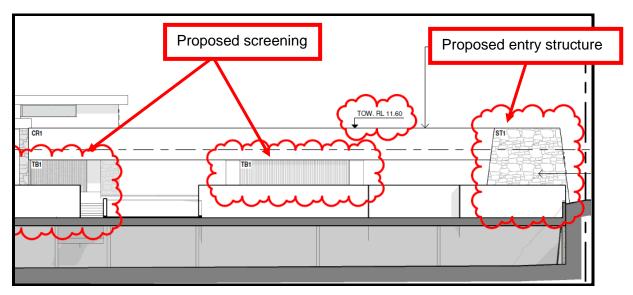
Proposed Car Park elevation to the foreshore (south) (Source: Innovate, Revision F)
